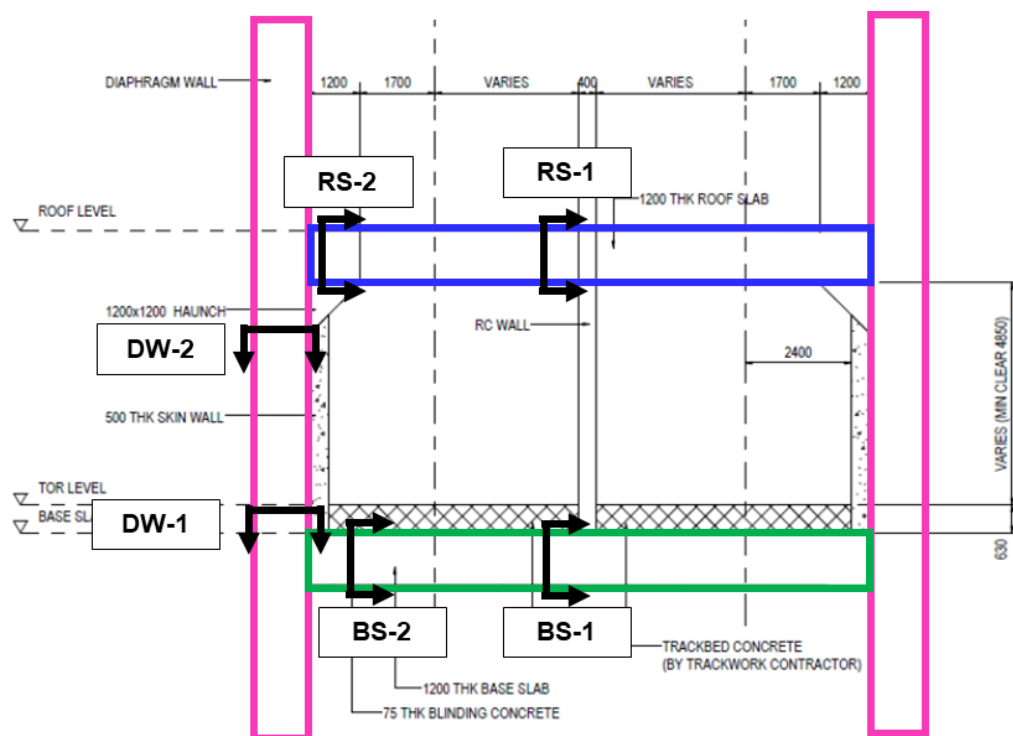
Location of design sections in C715 Cut-and-Cover Tunnel
